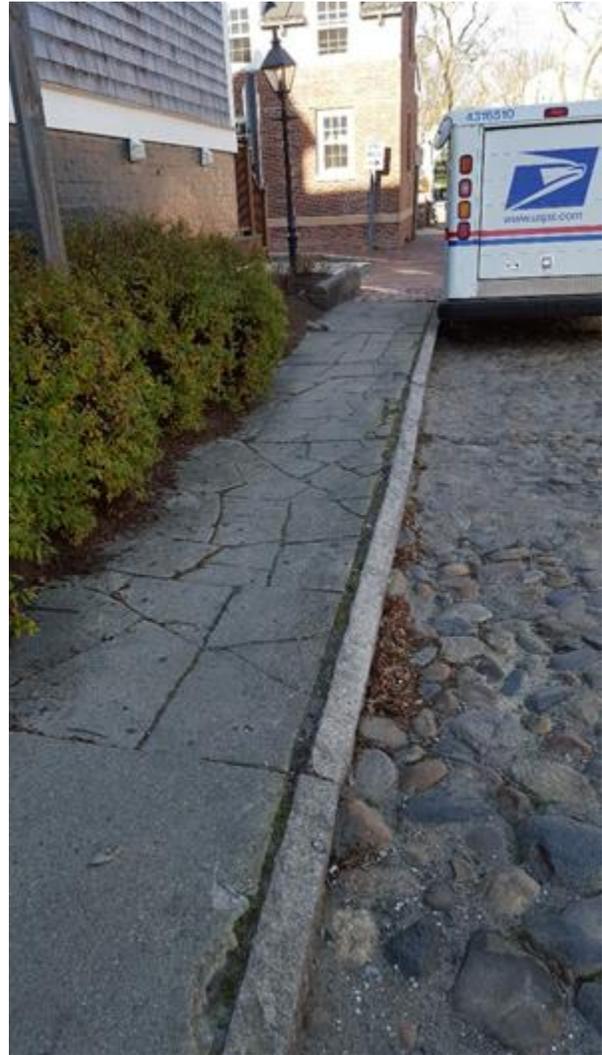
Example of a tree obstructing the sidewalk on Main St.
